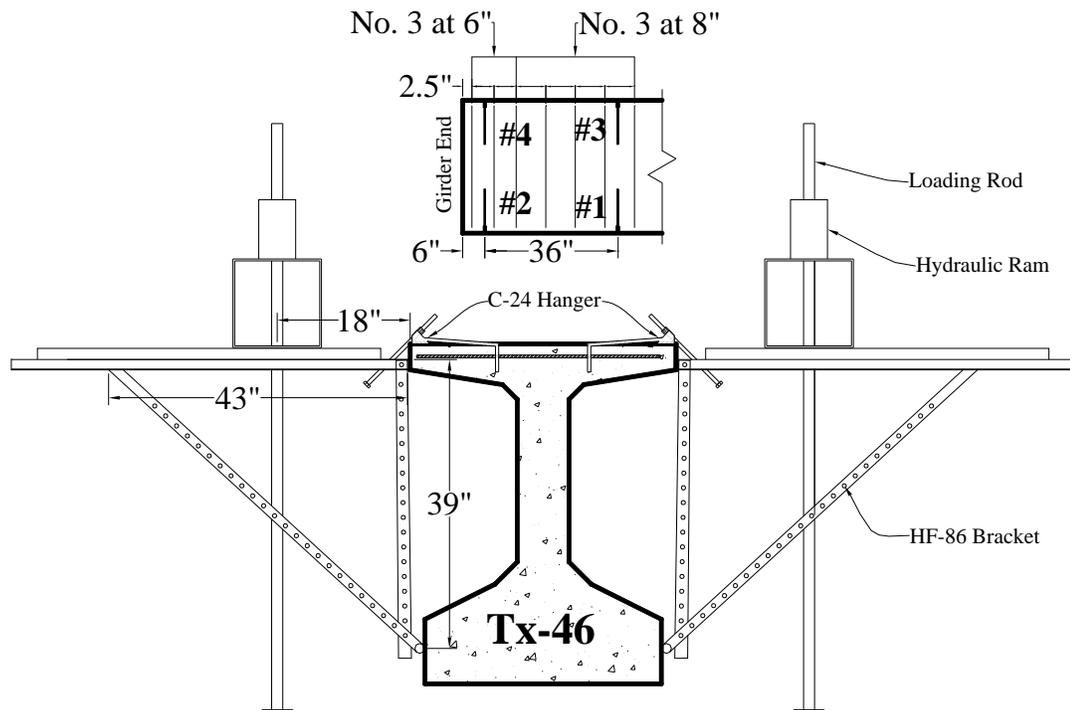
Reinforcement pattern and loading geometry for C-24 on Tx-46
